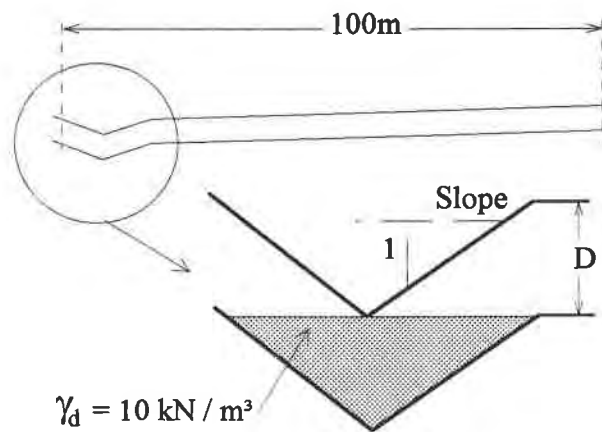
Configuration of the Lowest Point in a Drainage Pipe
